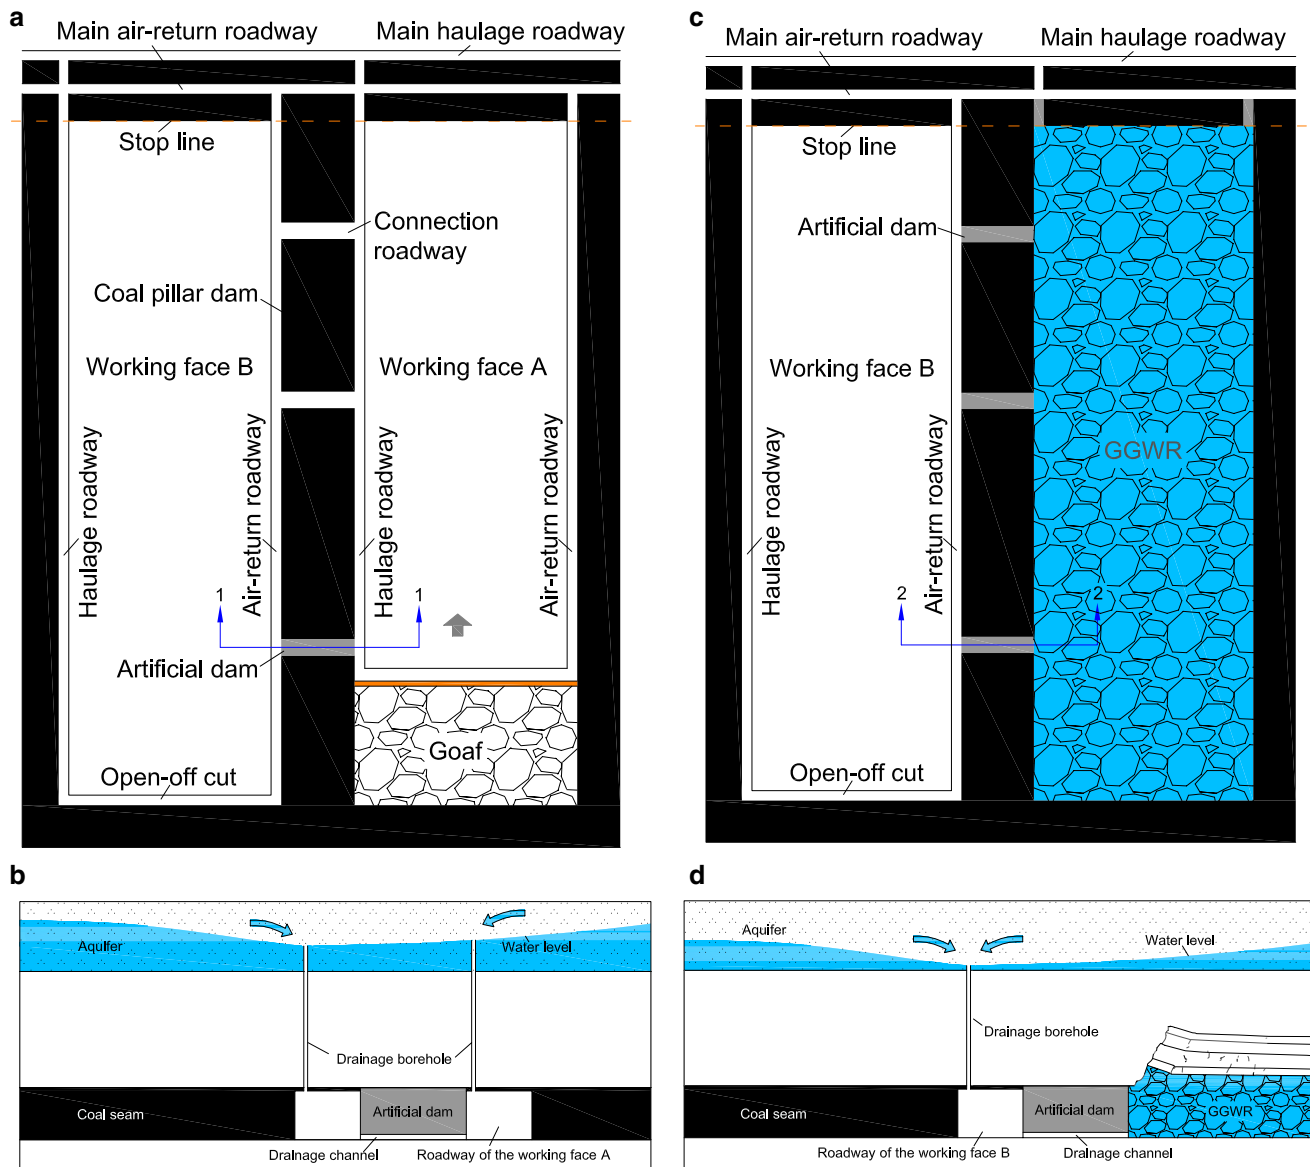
Process of the GGWR construction (a layout of the mining working face, b 1–1 profile of drainage boreholes layout, c diagram of water storing, d 2–2 profile of GGWR)
